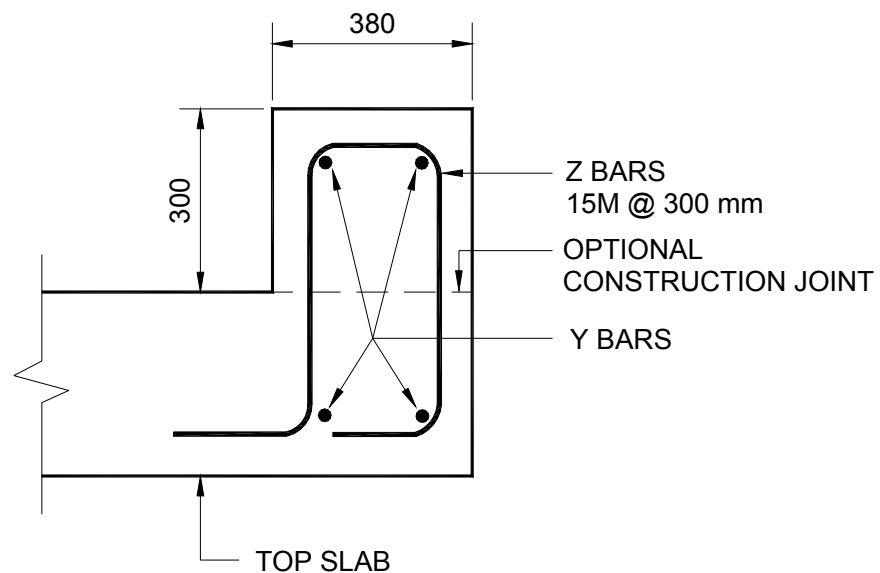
(b) SECTION AT HEADER WALL
